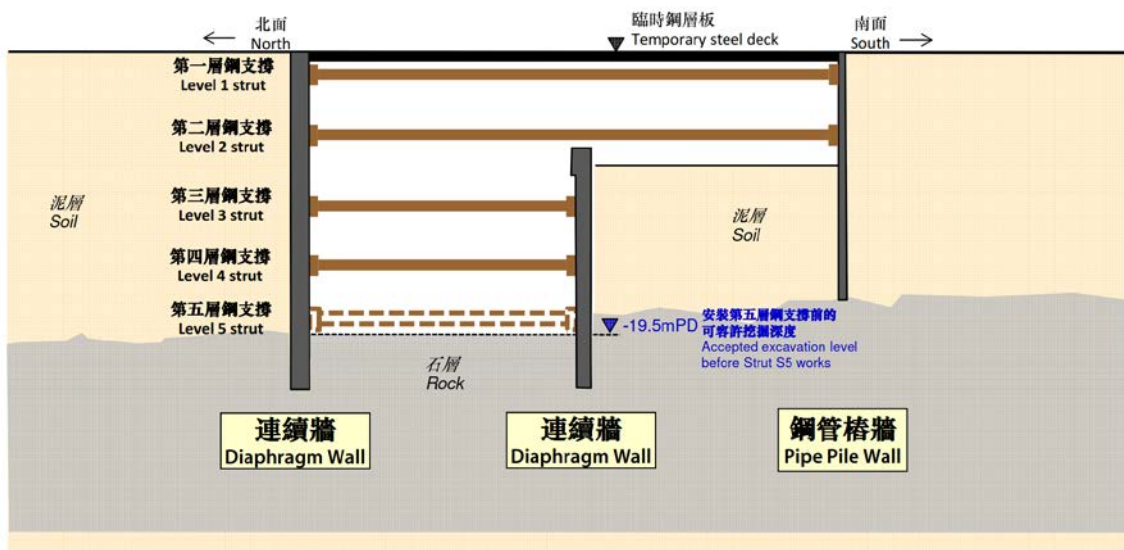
Cross section of EXC – excavation and installation of temporary steel strutting
